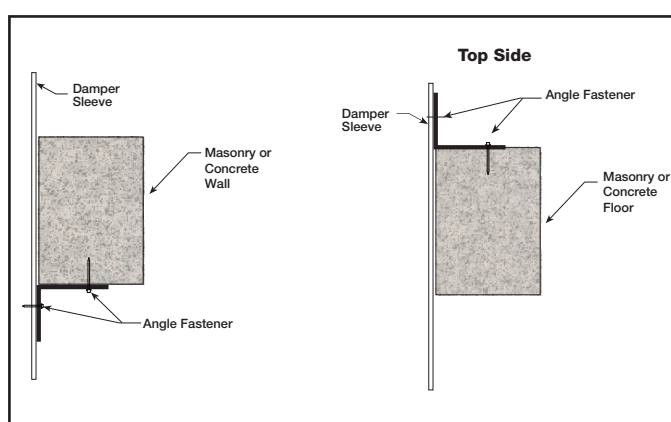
Single Side Angle With Masonry or Concrete Wall and Floor
